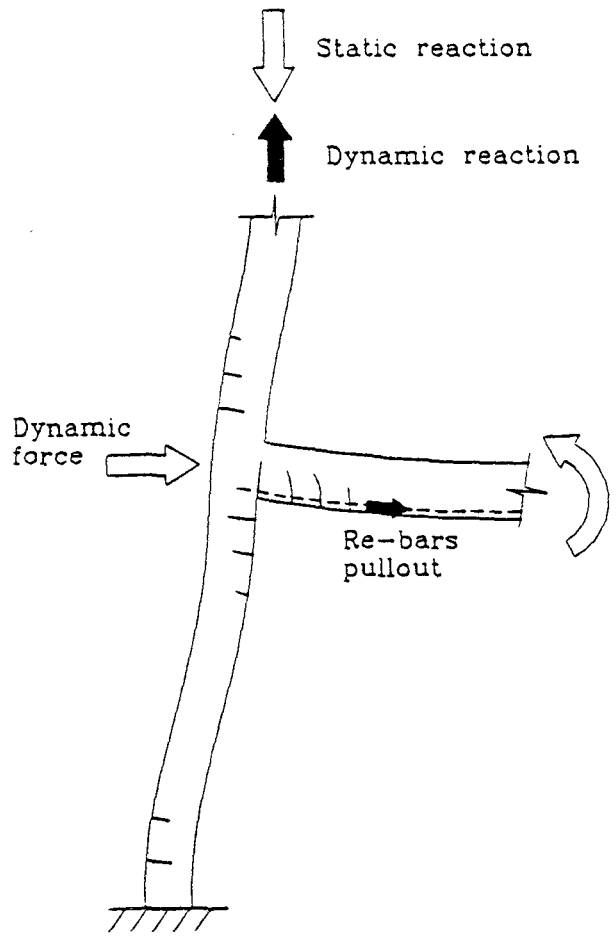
Re-bars Pullout at Exterior Beam-Column Joints.
